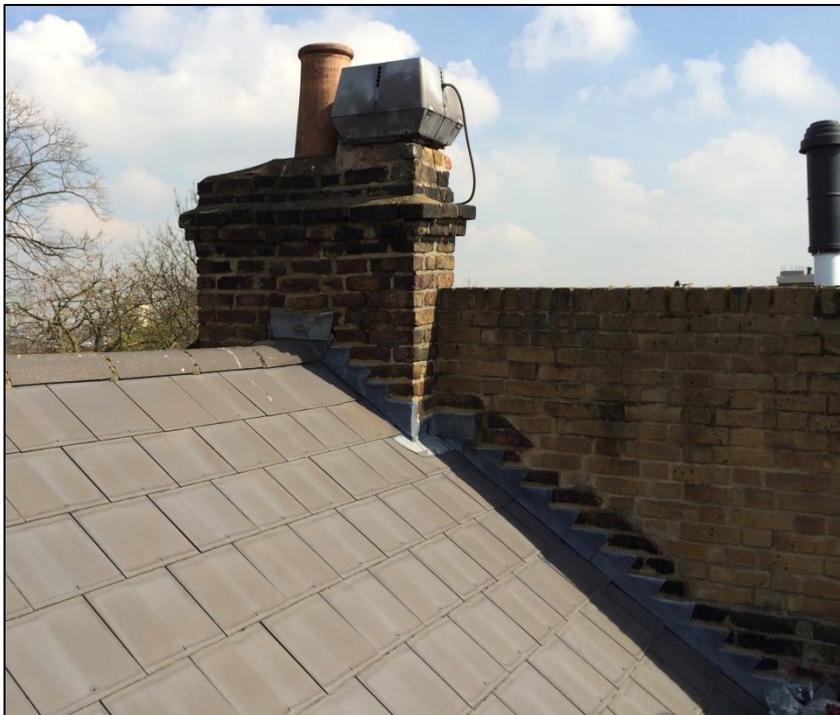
(above): Detail of the view towards inside face of south façade showing ‘modern’ new build-up of the party wall adjacent to the eastern (back) roof where the roof form/pitch may be original but all of the external roof fabric is later replacement likely from the mid to late 20th Century.
